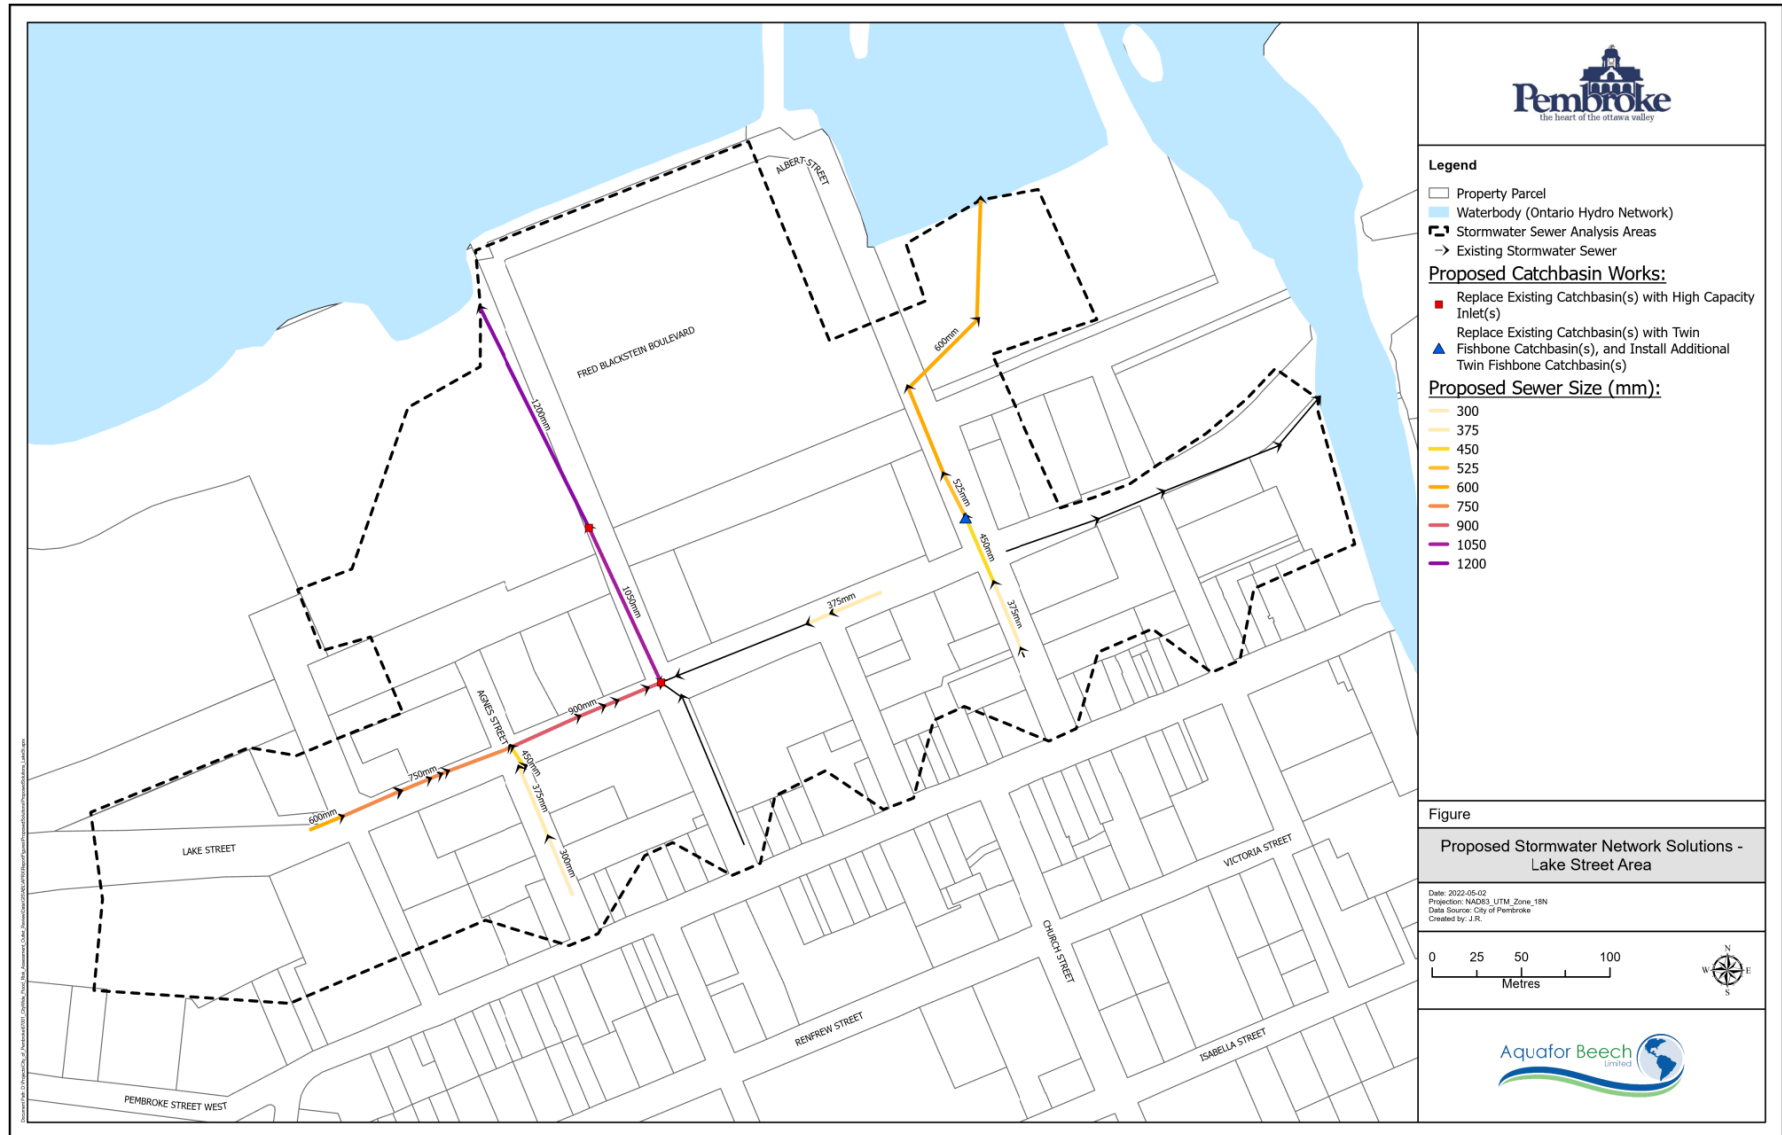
Proposed Stormwater Network Solutions of Lake Street Area
